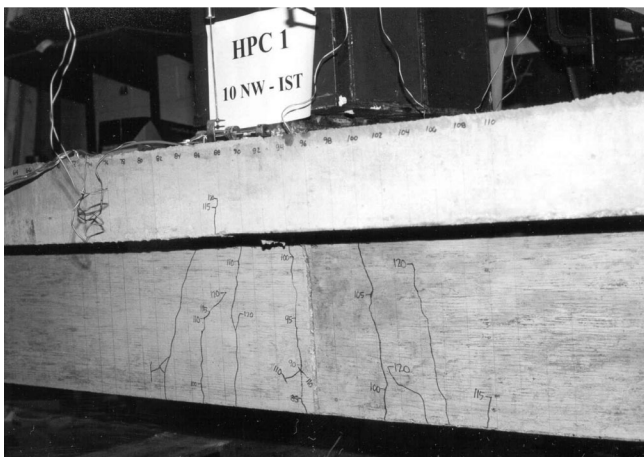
Multiple-strand development length specimen HPC-1 before failure (south face).
